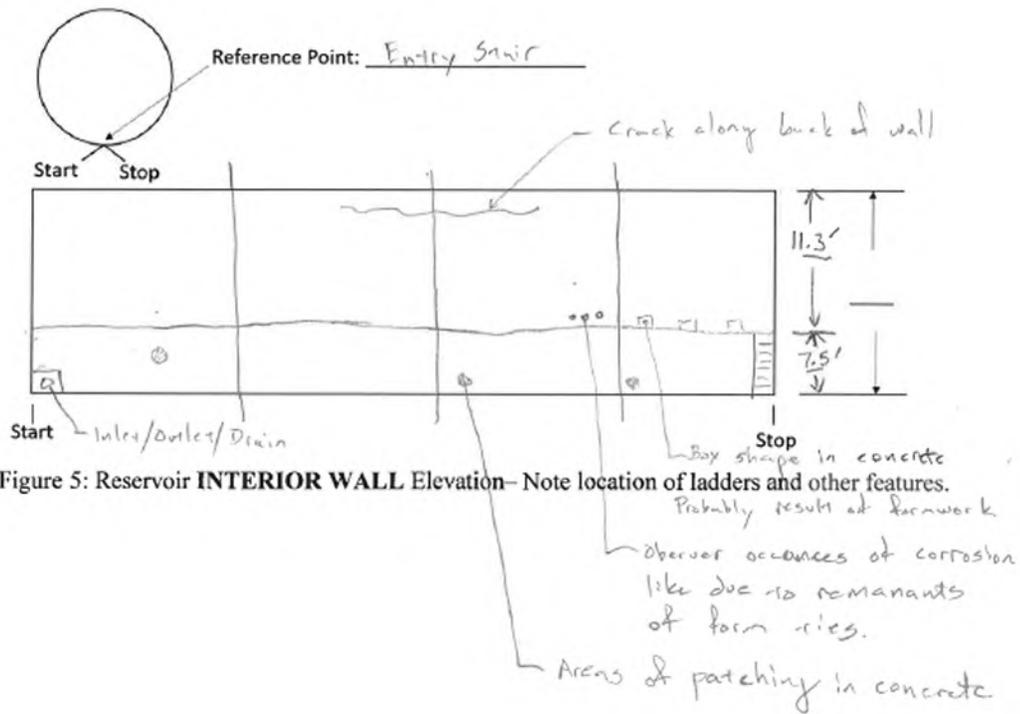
Reservoir INTERIOR WALL Elevation— Note location of ladders and other features.
